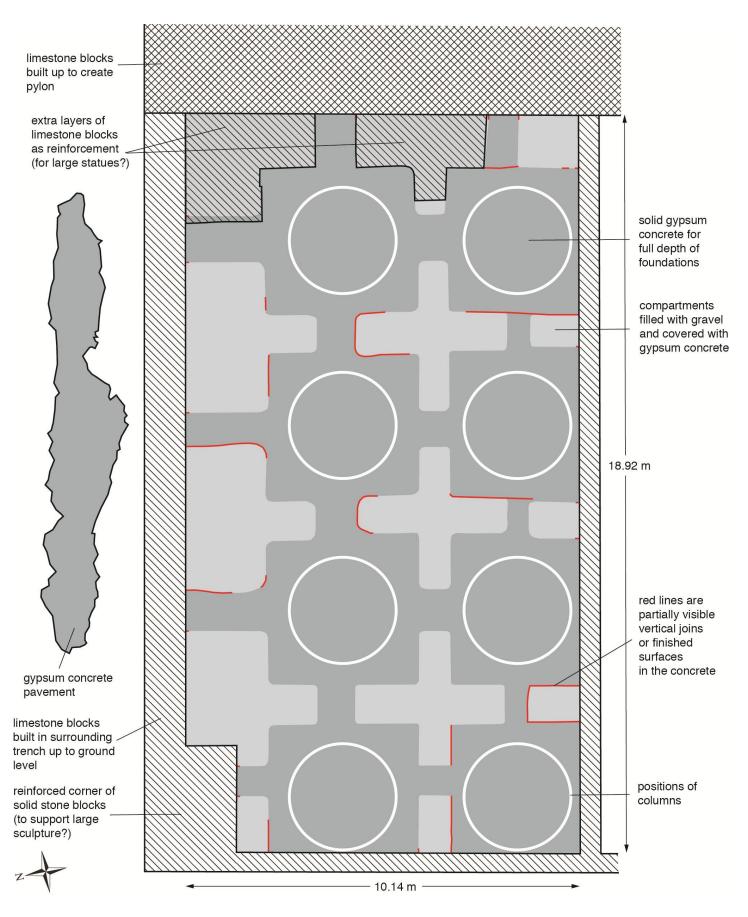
Outline plan of the north gypsum platform in front of the first stone pylon of the temple, showing the main constructional elements.
